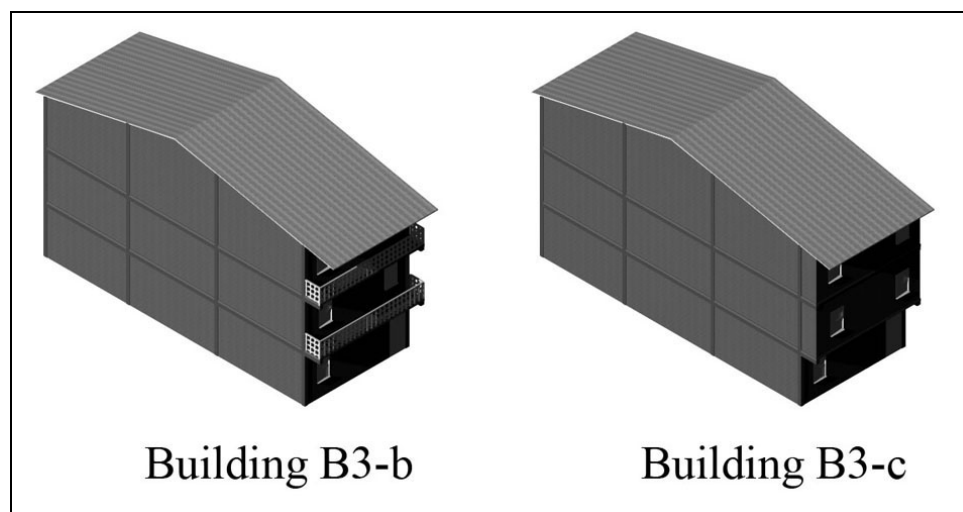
Isometric drawings for buildings B3-b and B3-c.
